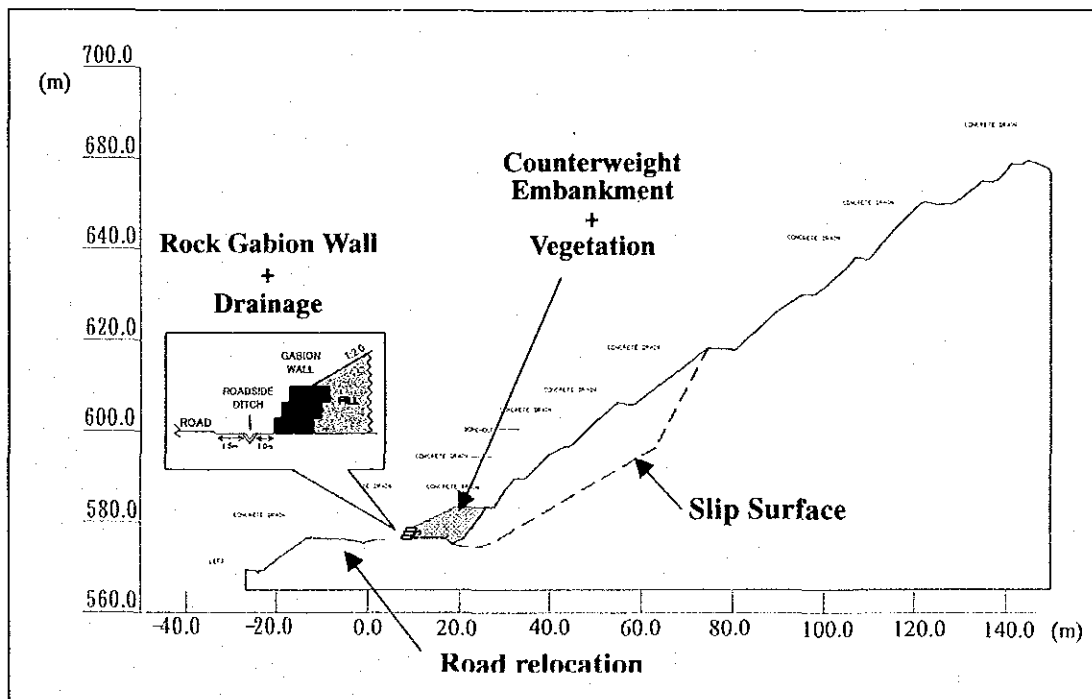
Cross section of countermeasure embankment CH 27.00 km
